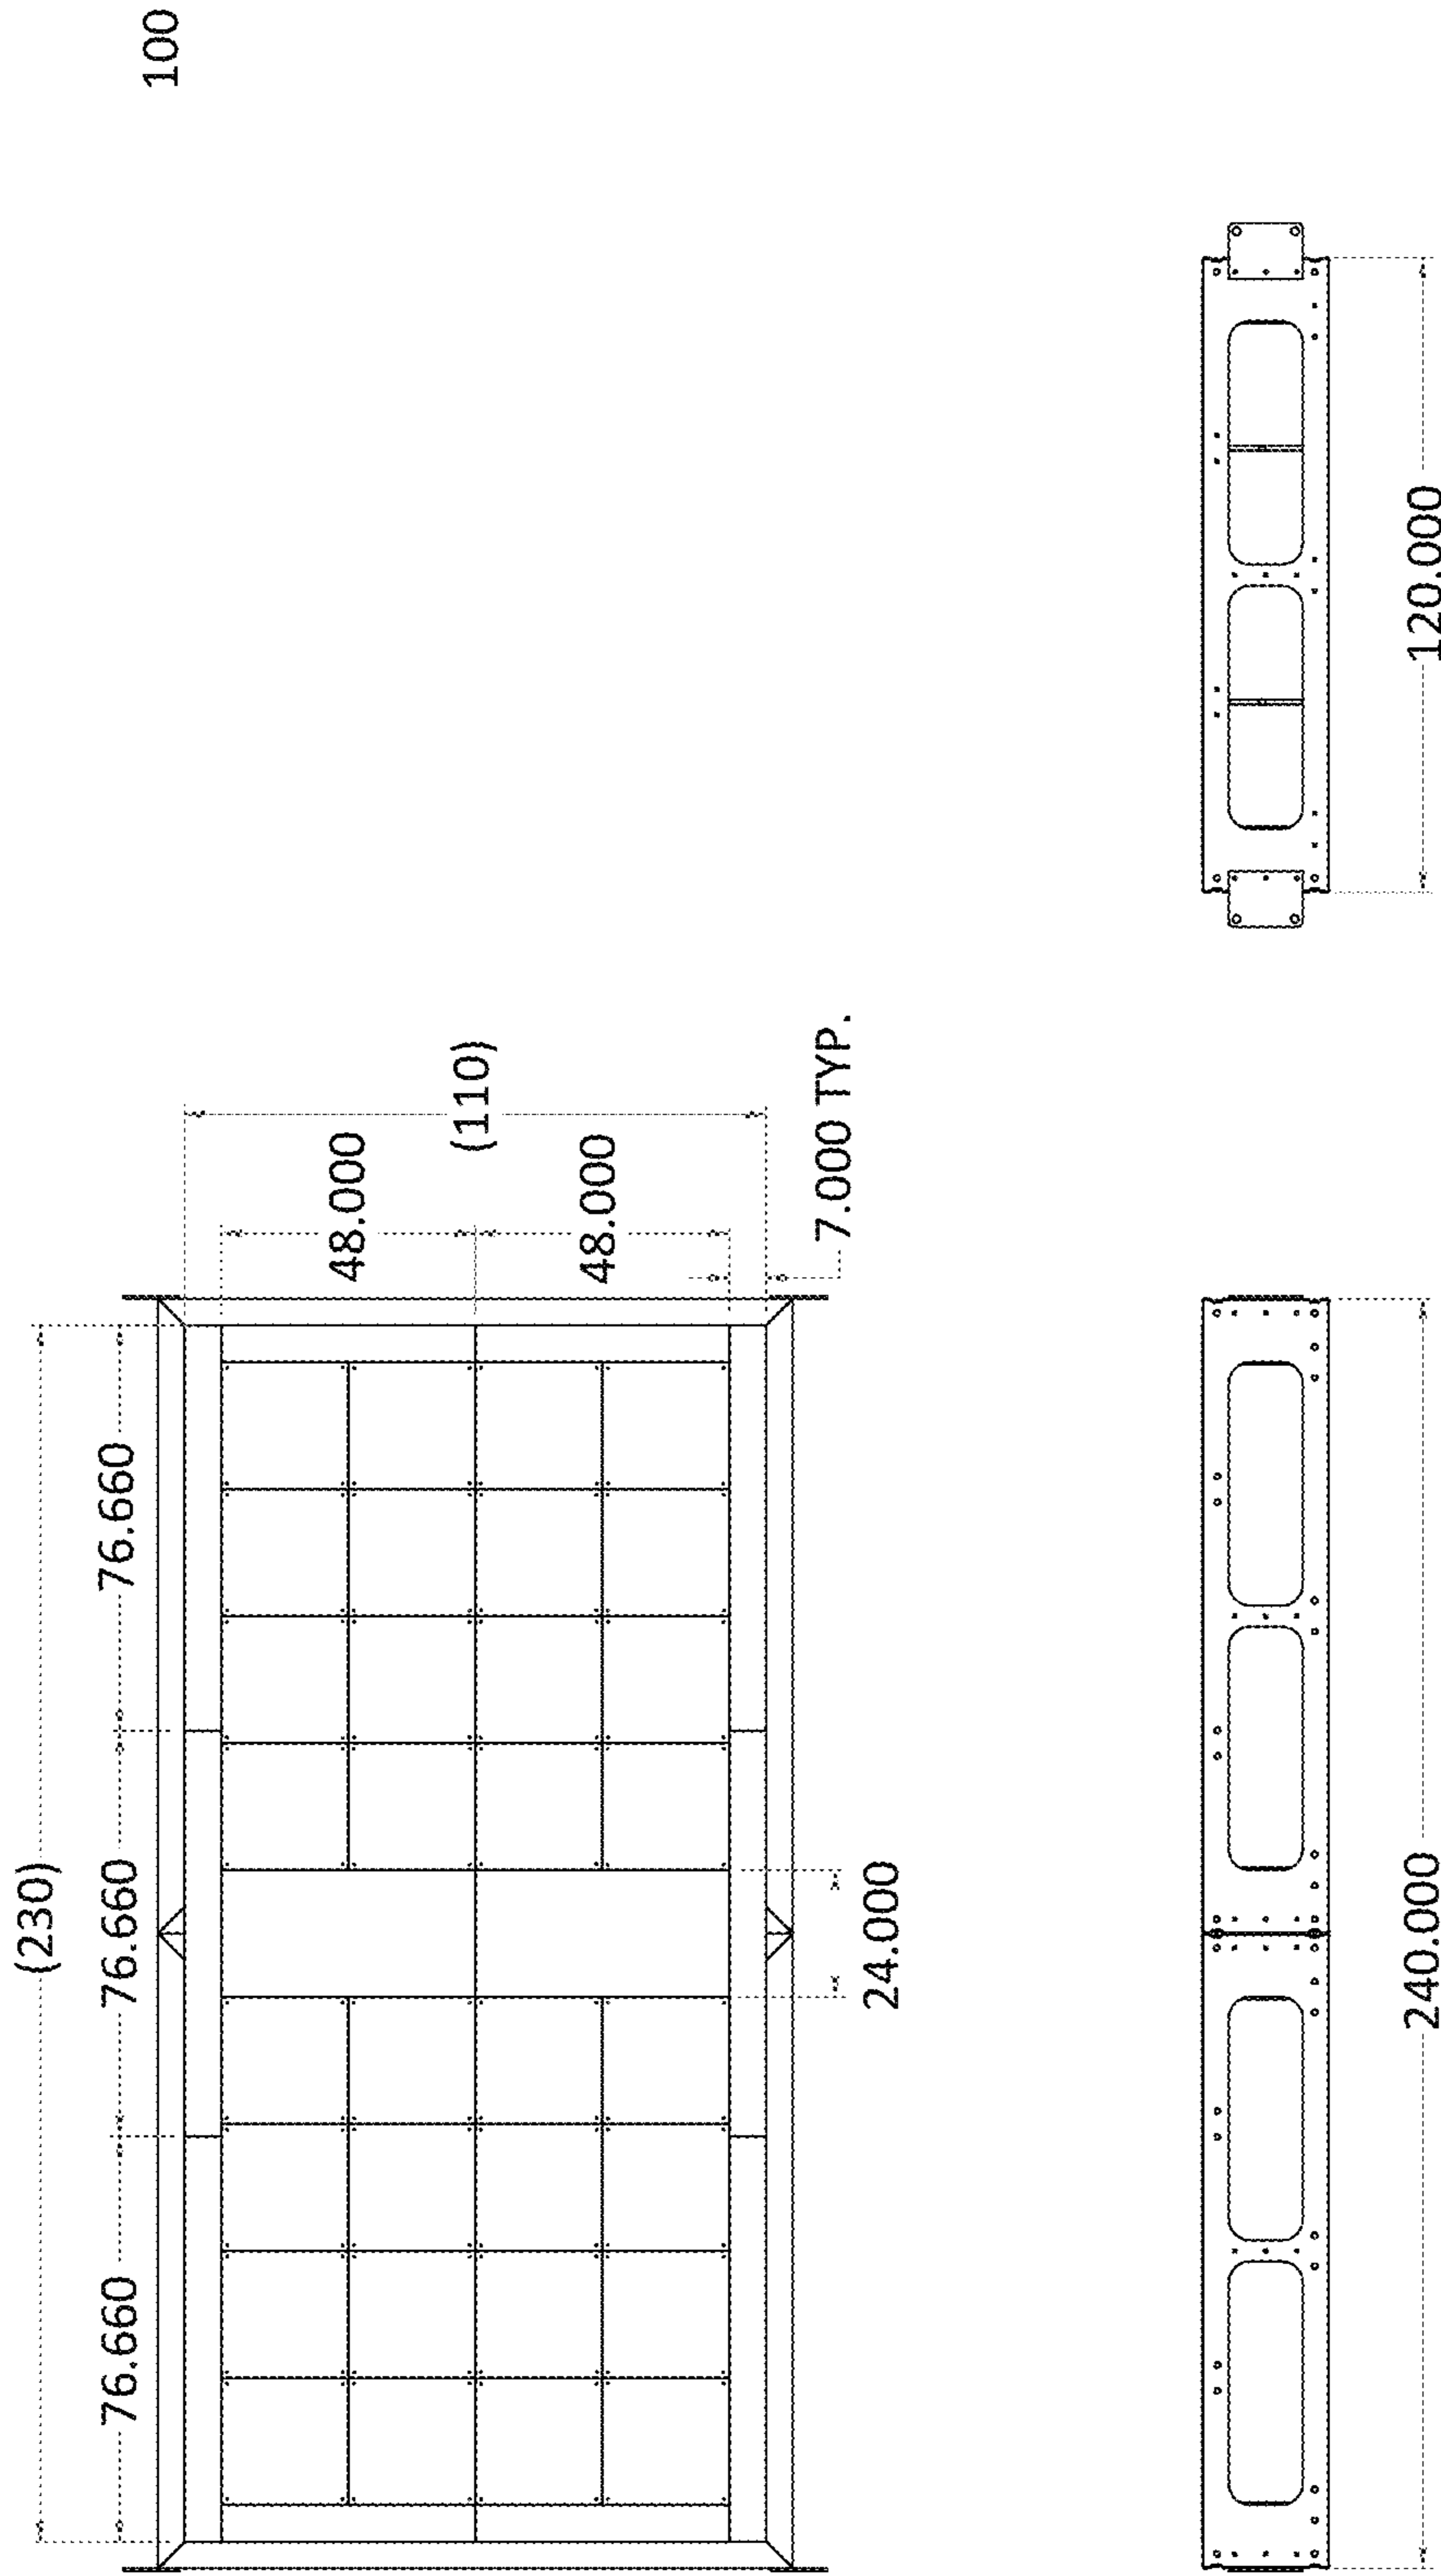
BASE FRAME WITH RAISED FLOOR AND INFILL FLOOR PLATES
